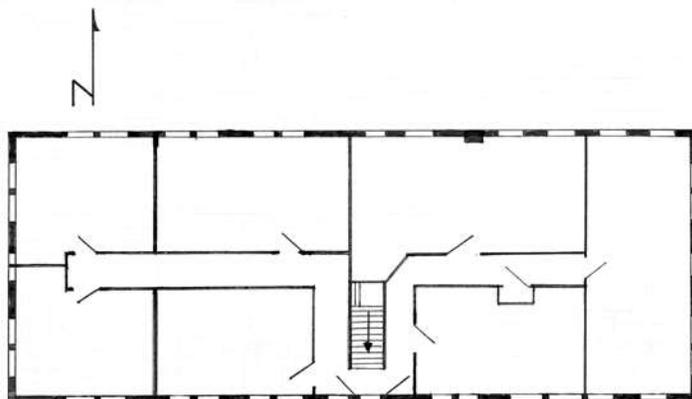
Image D: Second Floor Plan for the Journal Printing Company Building (2010). Not to scale.
